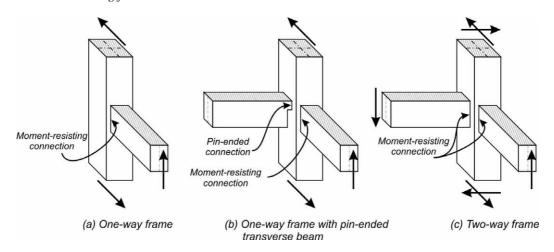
Classification of precast concrete moment-resisting systems according to the in-plane lateral force resisting mechanisms
